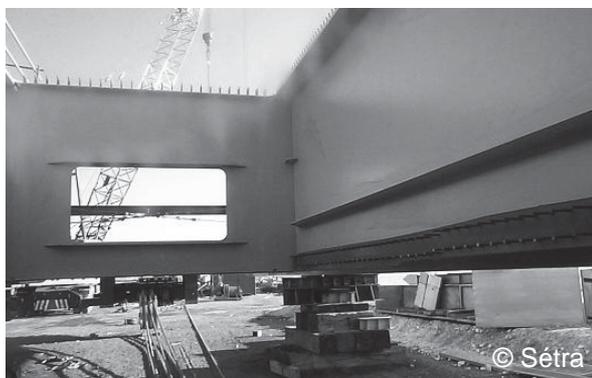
Railway twin-girder bridge (TGV Est, Canal de l'Ourcq) with diaphragms, France, 2006.
